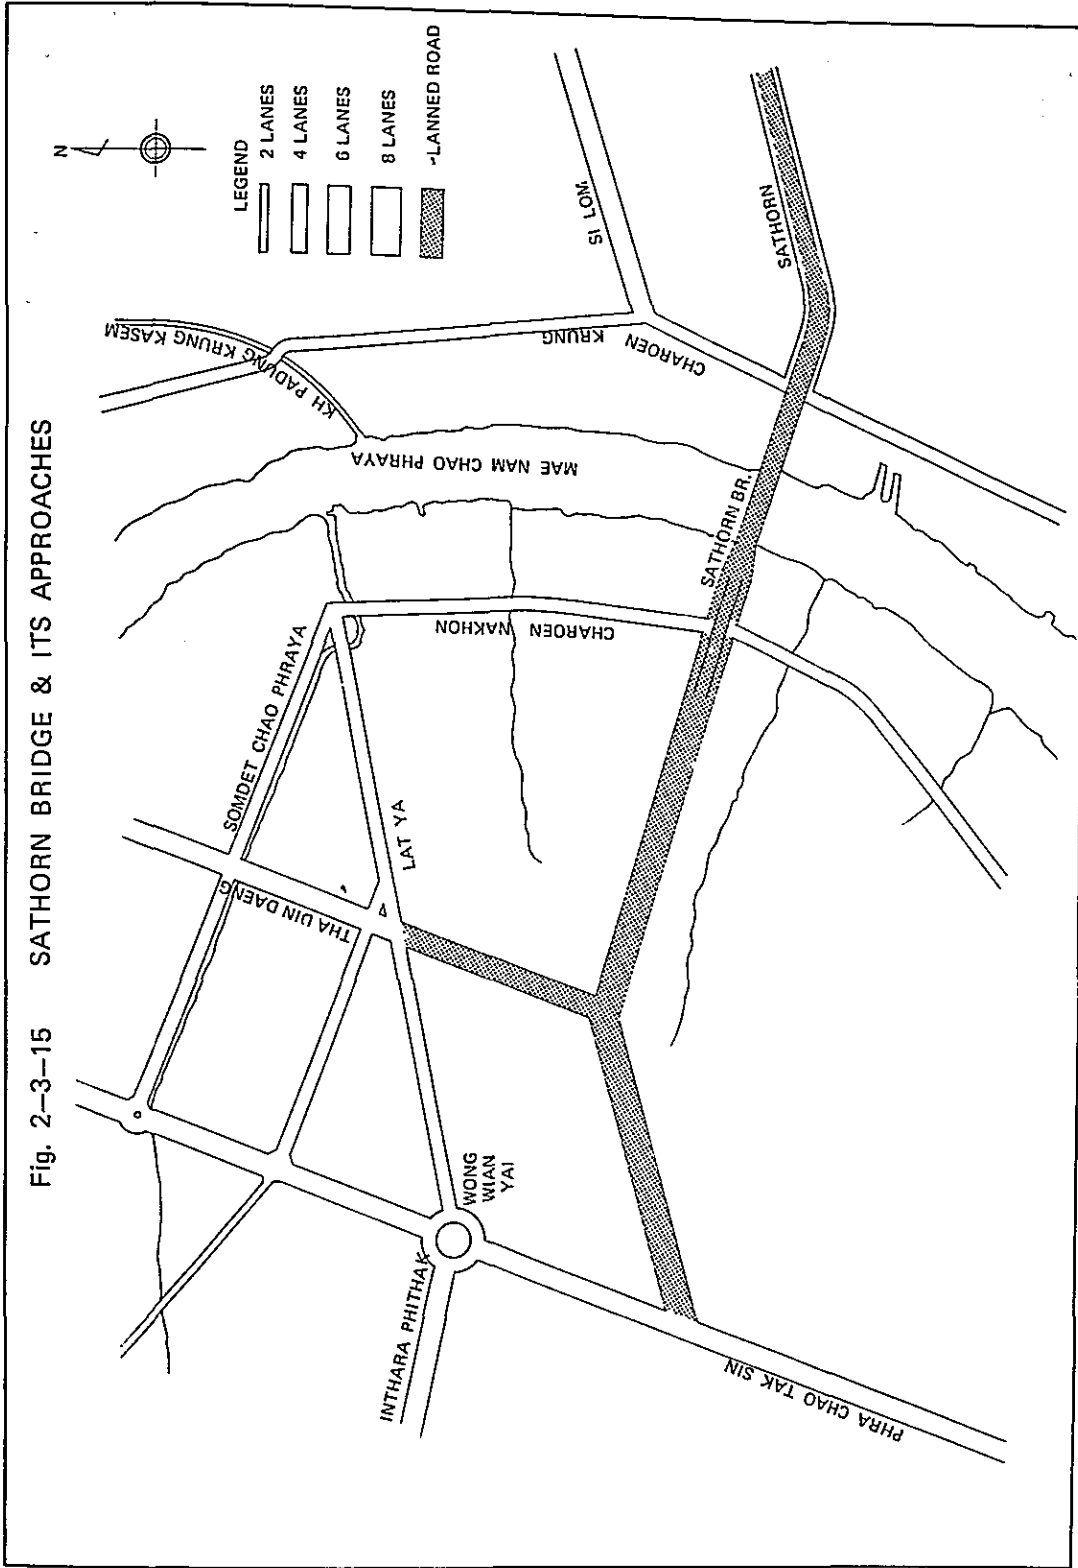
SATHORN BRIDGE & ITS APPROACHES
